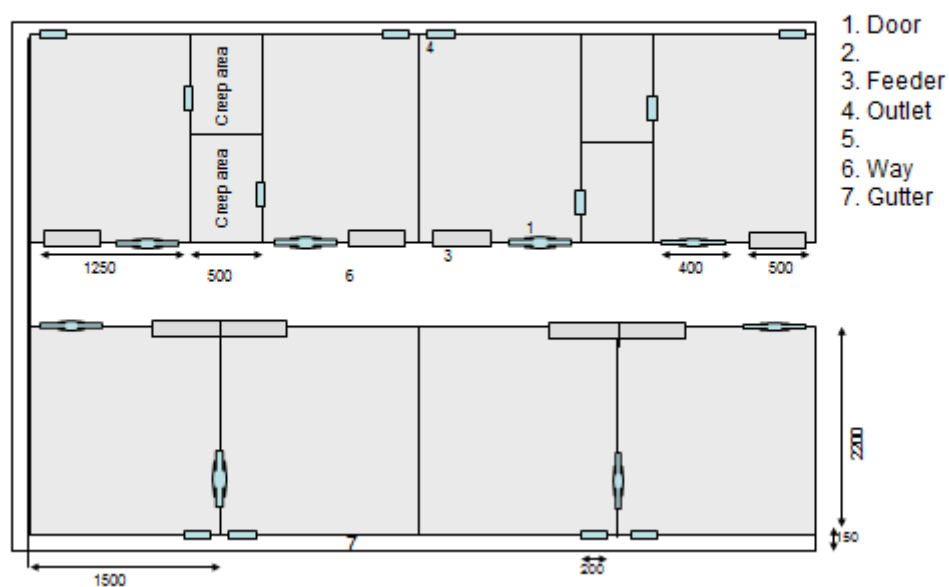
Design of intensive pig house with creep boxes constructed between farrowing pens.
